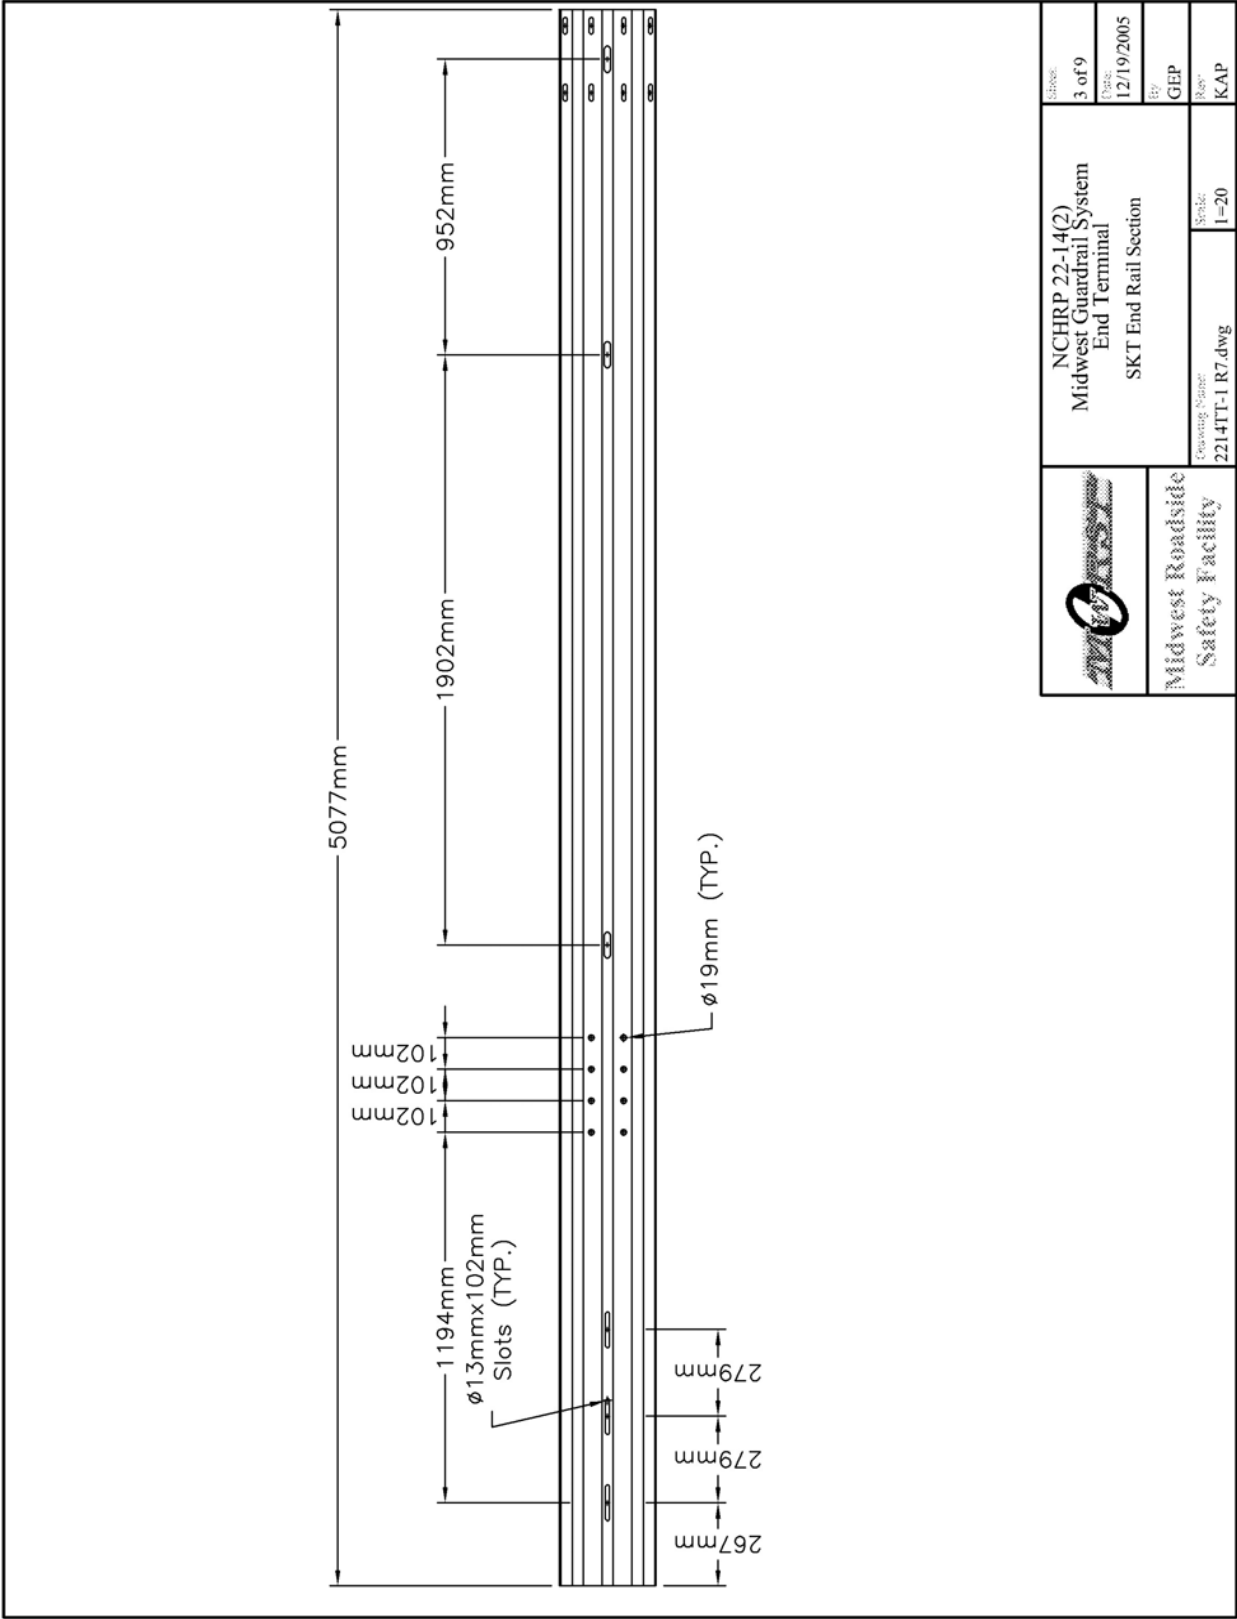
Midwest Guardrail System End Terminal - End Rail Details
